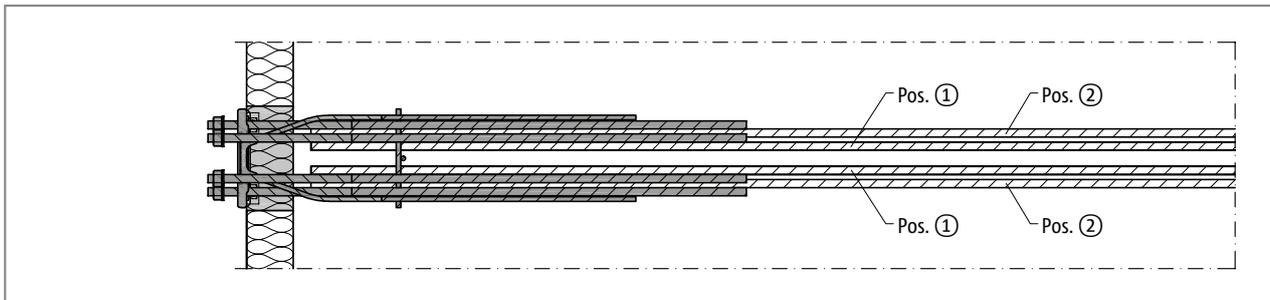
Schöck Isokorb® T type SK-MM1: On-site reinforcement: Plan view
